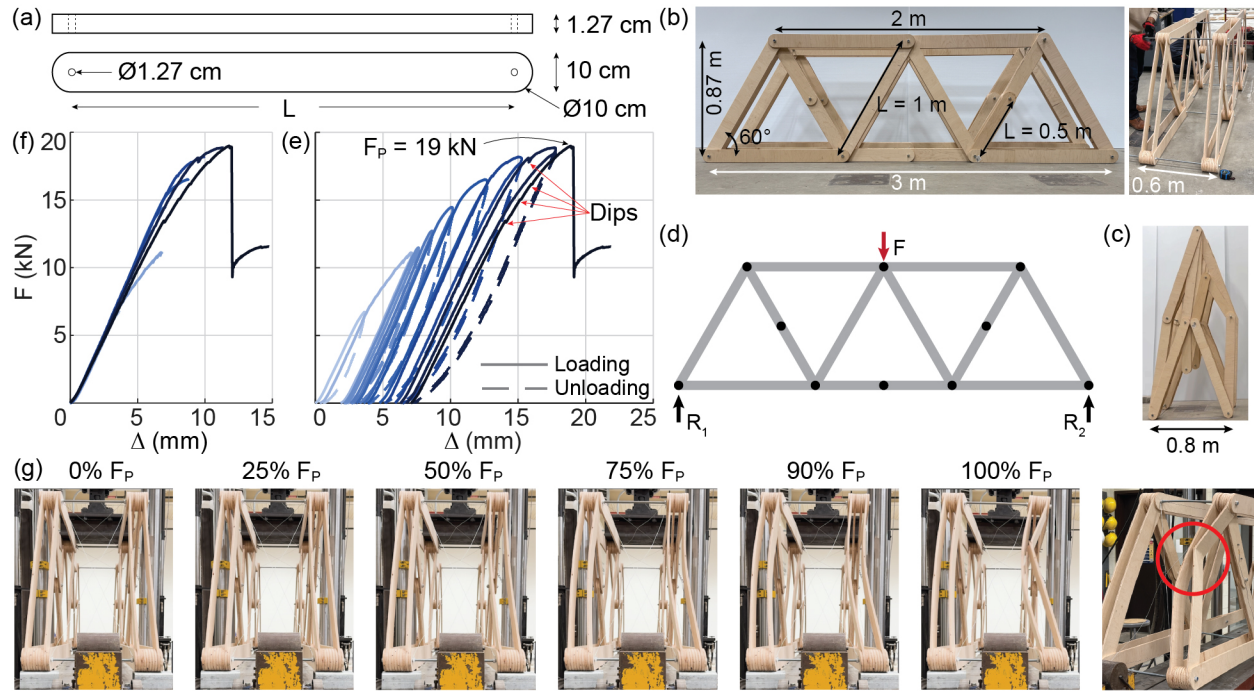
Warren truss prototype. (a) Dimensions of the Maplewood members, shown in top (upper) and side (lower) views; (b) Side (left) and oblique (right) views detailing the overall dimensions of the structure; (c) Stowed configuration of the Warren truss bridge; (d) Schematic representation of the three-point-loading test, illustrating the load and supports; (e) Complete Load (F) vs. Displacement (Δ) curve of the cyclic three-point-loading test. The truss weighs 38 kg and can support a load of 19 kN; (f) Load-Displacement curve depicting the initial loading phase of each cycle for all specified displacement limits after removing accumulated structural displacement; (g) End-view of the structure during loading—local elastic buckling of the truss members results in shortening of diagonals, which subsequently leads to larger global and local buckling as the structure approaches the point of failure.
